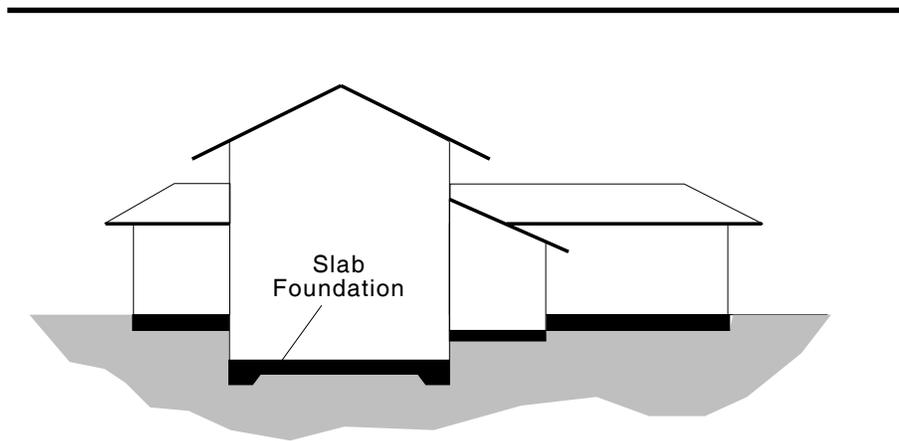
Slab foundations. *If your house was built on a concrete slab, it is probably bolted to its foundation.
